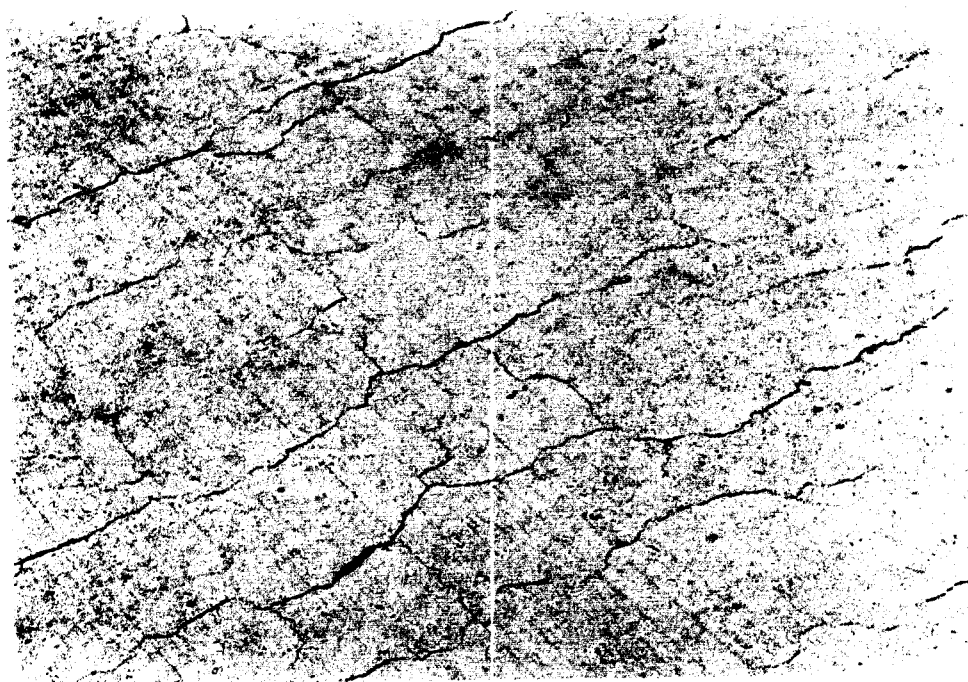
DESTRUCTIVE ALKALI-SILICA REACTION IN PAVEMENT. A. Pavement.
